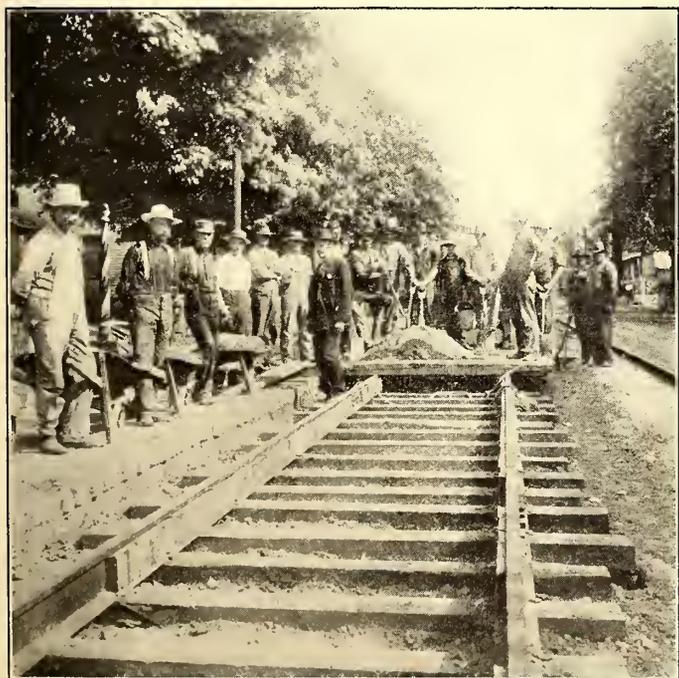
VIEW ON MAIN STREET, BATTLE CREEK, SHOWING TRACK WITH FILLER BLOCK IN PLACE PREPARED FOR CONCRETE
